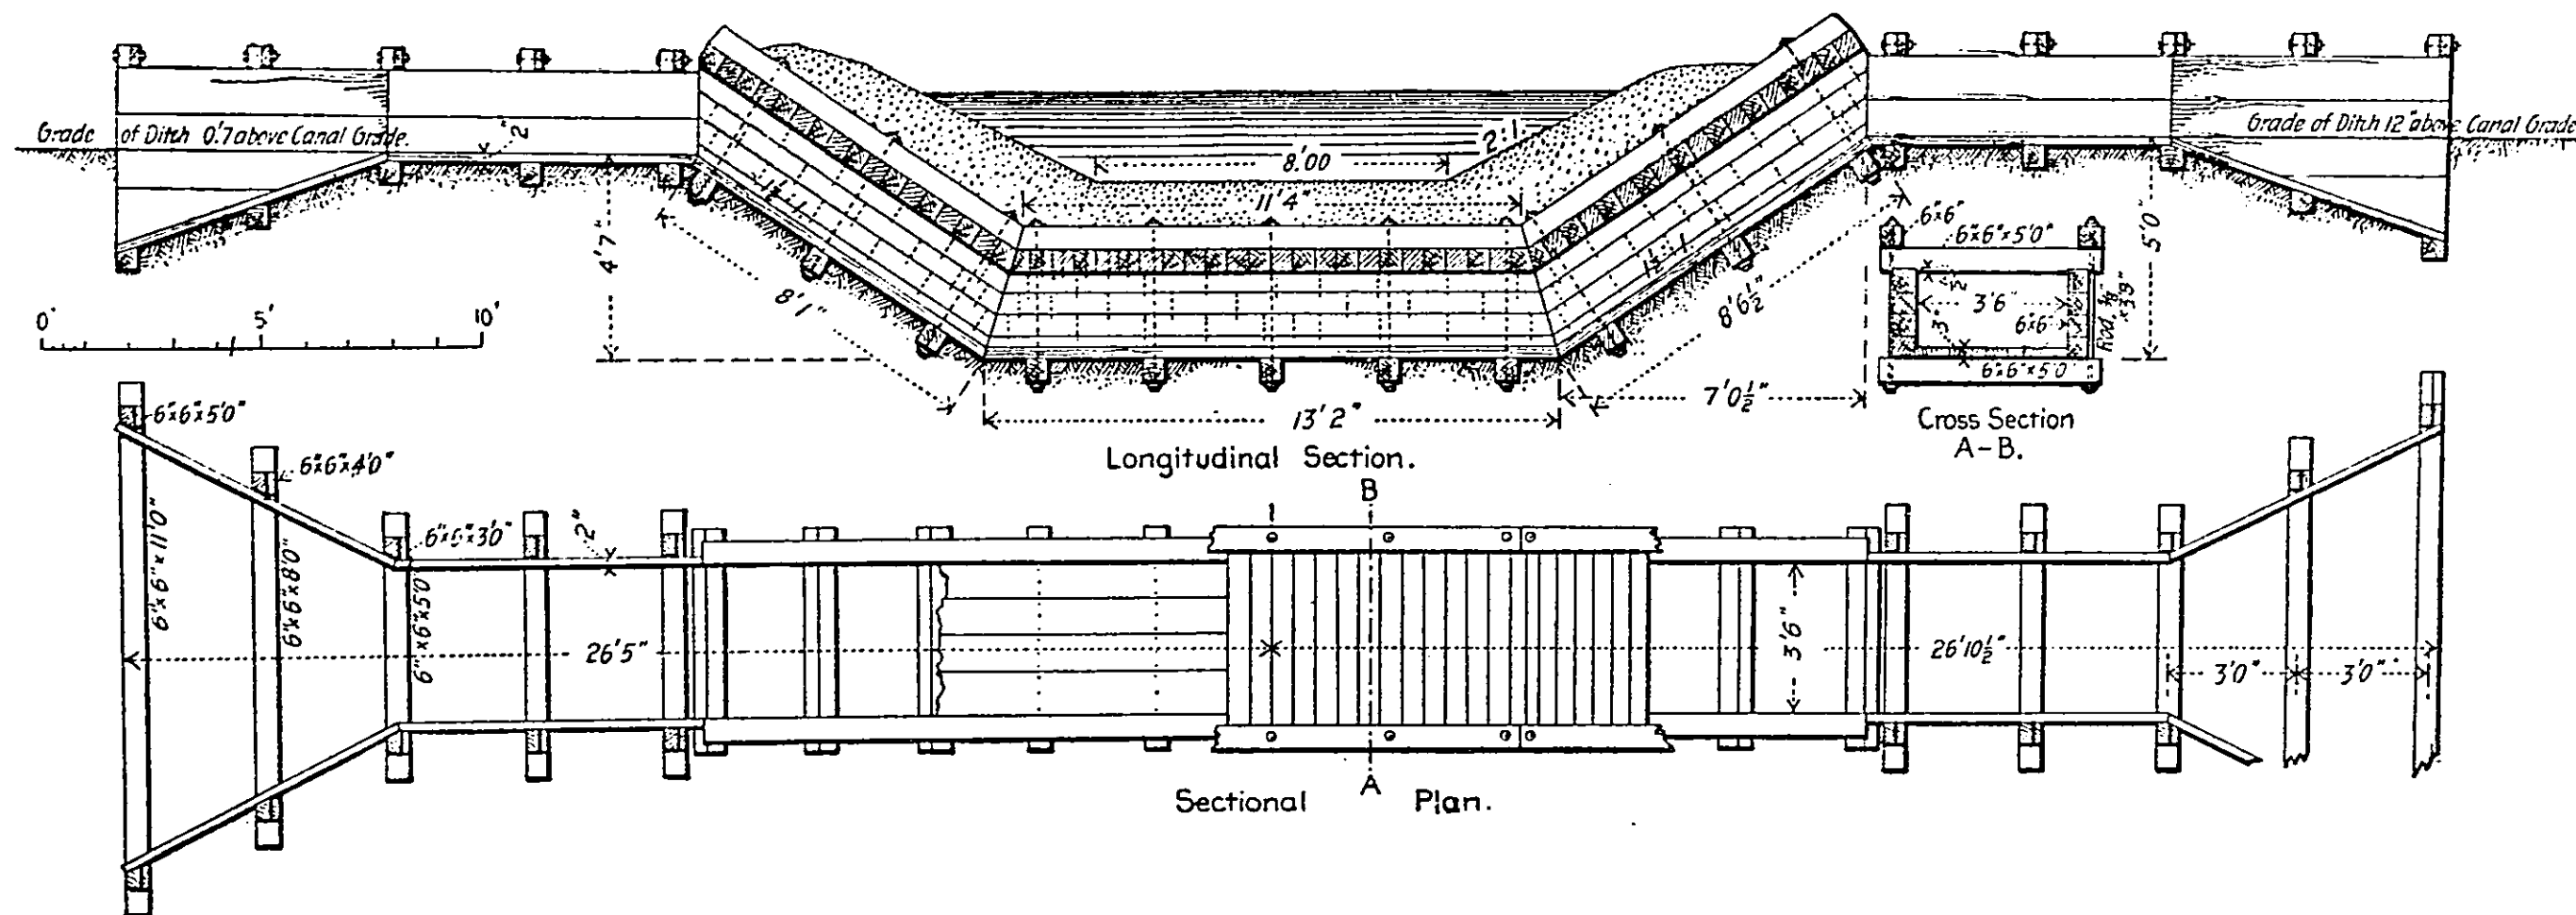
Inverted Siphon for passing old canal, Bear River, Utah.
